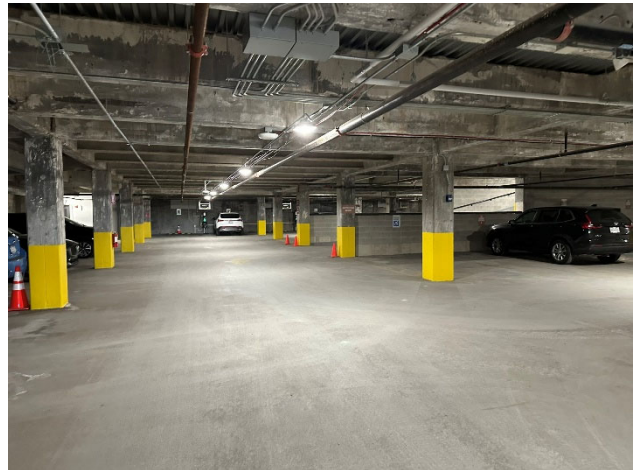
Concrete cover system in western central portion of basement in vicinity of MW-4, looking west.
